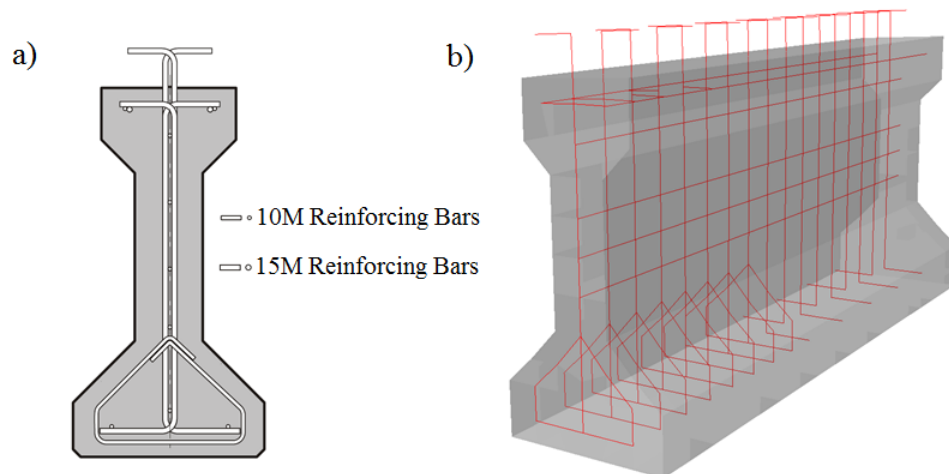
Reinforcement bars in the AASHTO type II girder: a) girder cross section, b) FE model of girder reinforcement
